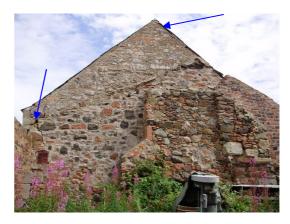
Gaps under slates at gable end in Building 7. Location of Roost 1 shown in red
